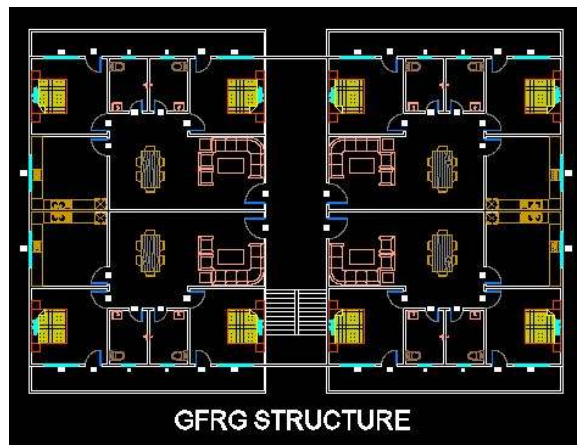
A Typical working drawing of the building plan of the GFRG structure
